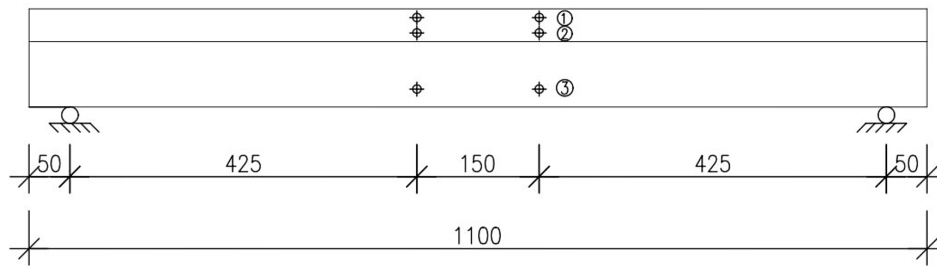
Beam diagram with bases for measuring concrete deformations at cross-section height
